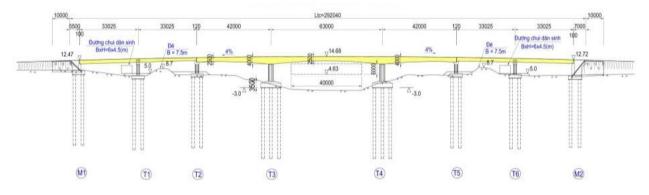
Layout of Ben Huong bridge (over Thuong river)
